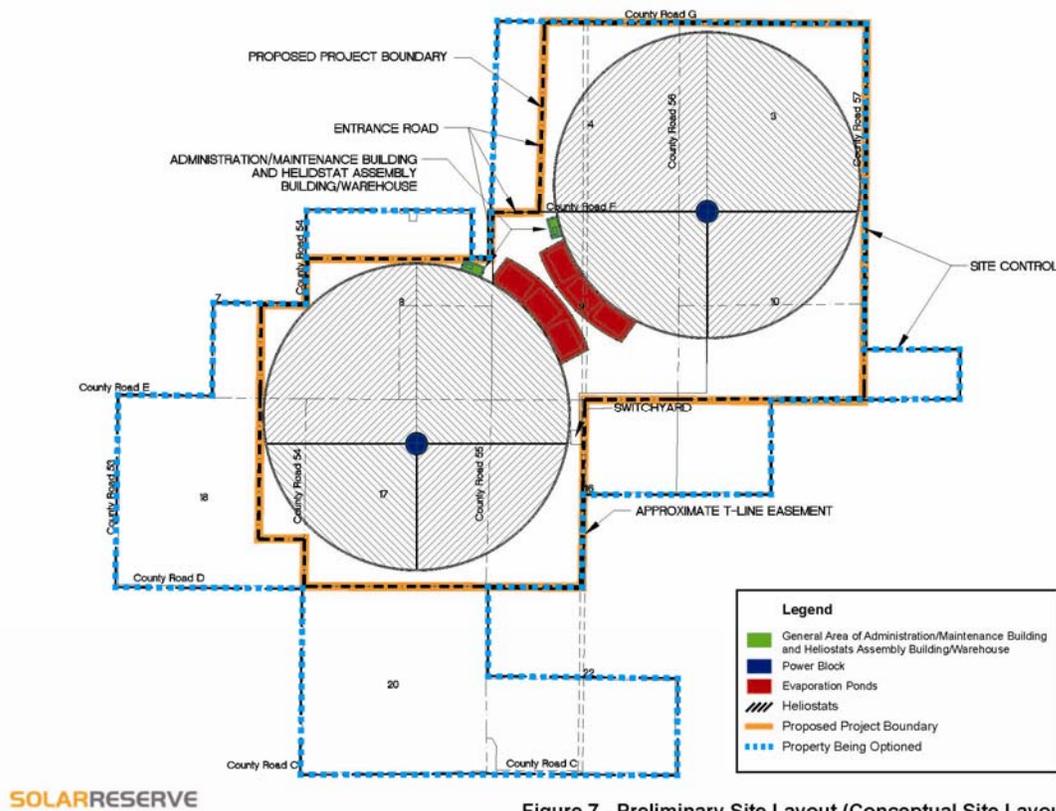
Preliminary Site Layout (Conceptual Site Layout)
